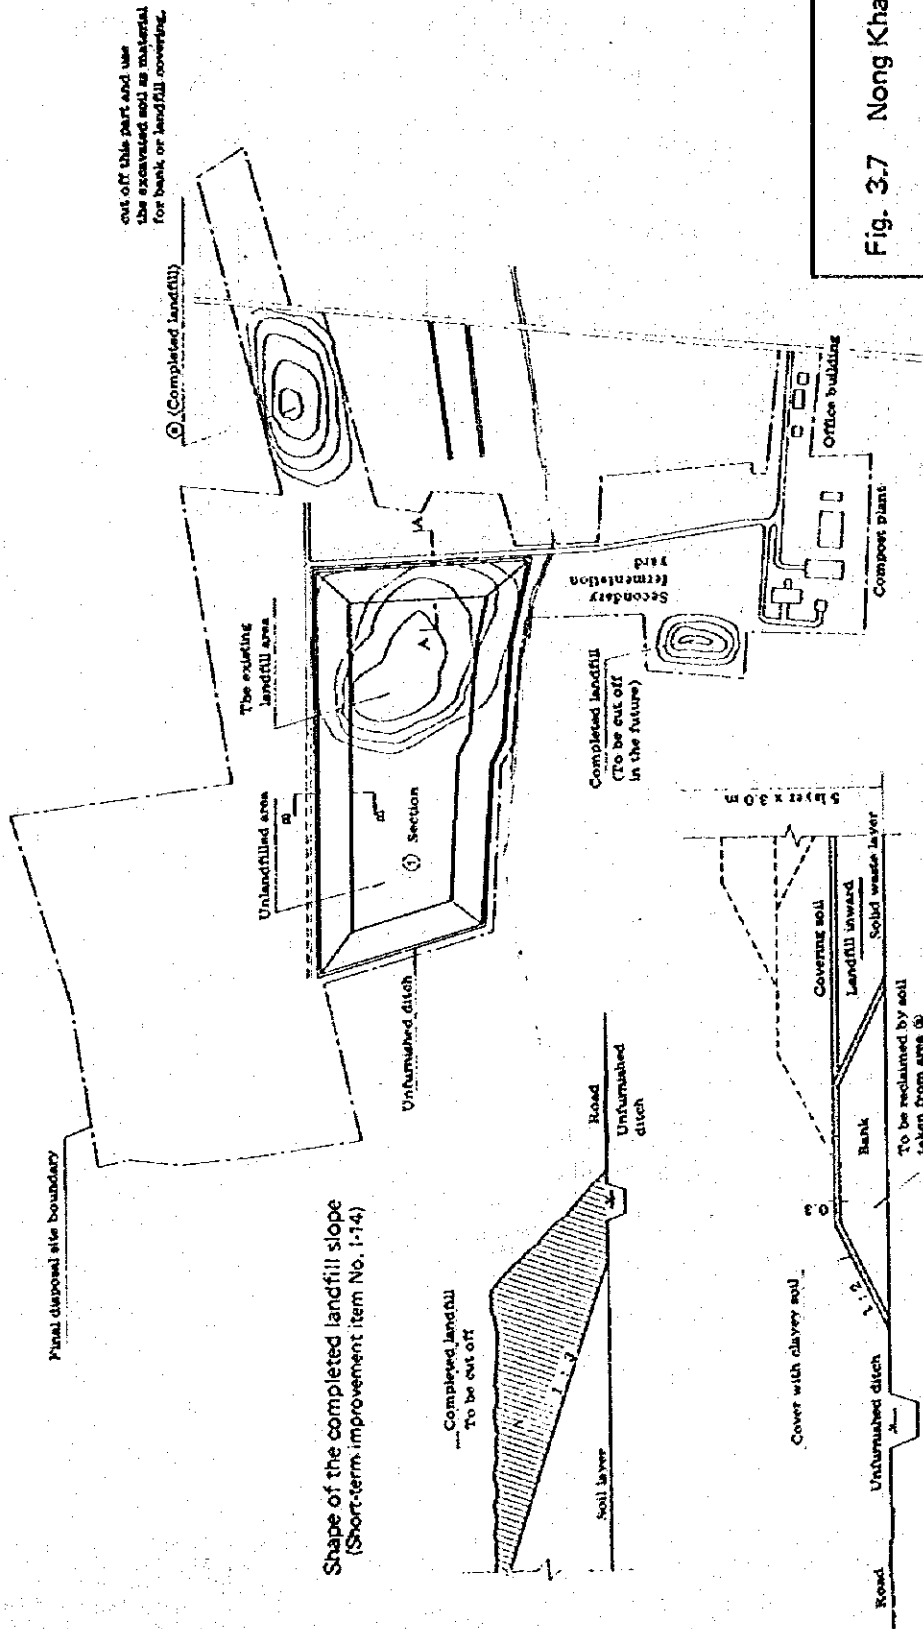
Nong Khaem landfill site short-term improvement plan
